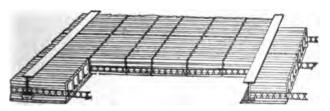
Reinforcing a Flat Arch. The Wire Trusses Are Placed Between Each Course
